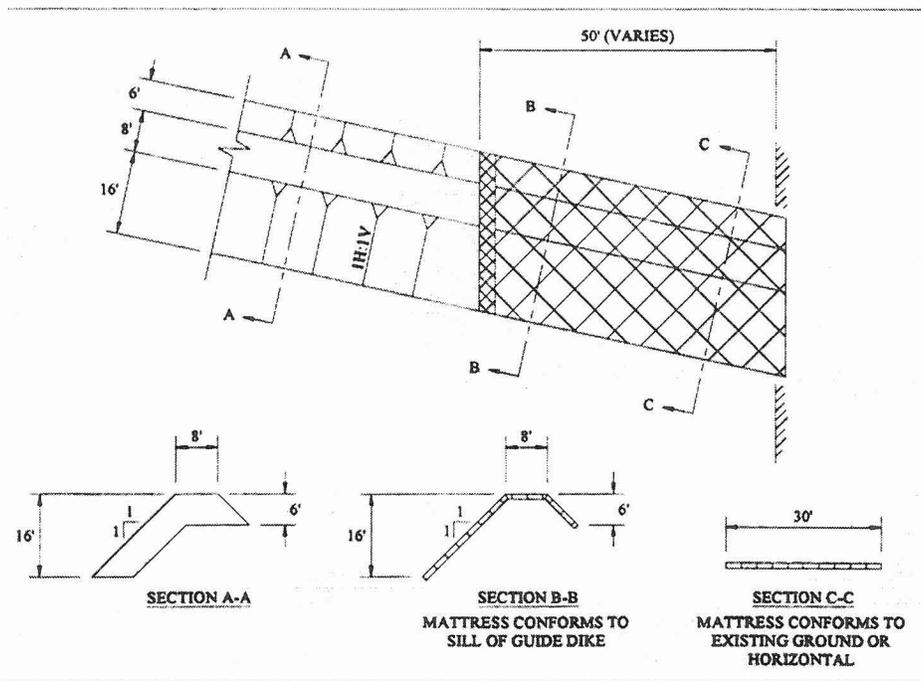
Plan view of revised guide dike design, end detail for layout of gabion mattress near outer bank.
